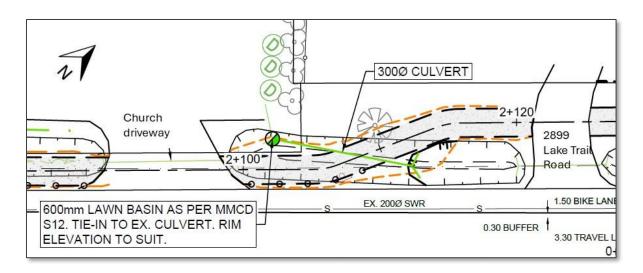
Proposed Project scope between the church driveway and 2899 Lake Trail Road driveway including culvert installation.
